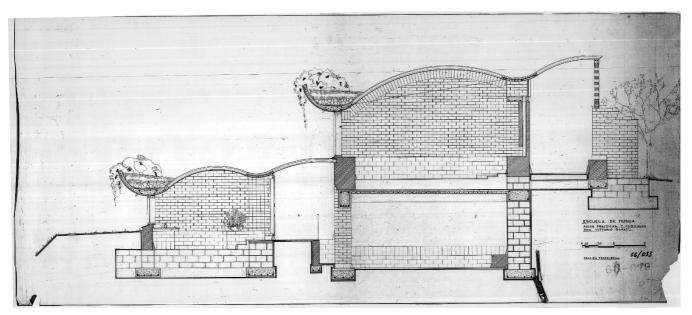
Architectural cross section. Original drawing by Vittorio Garatti (ISA archive).
